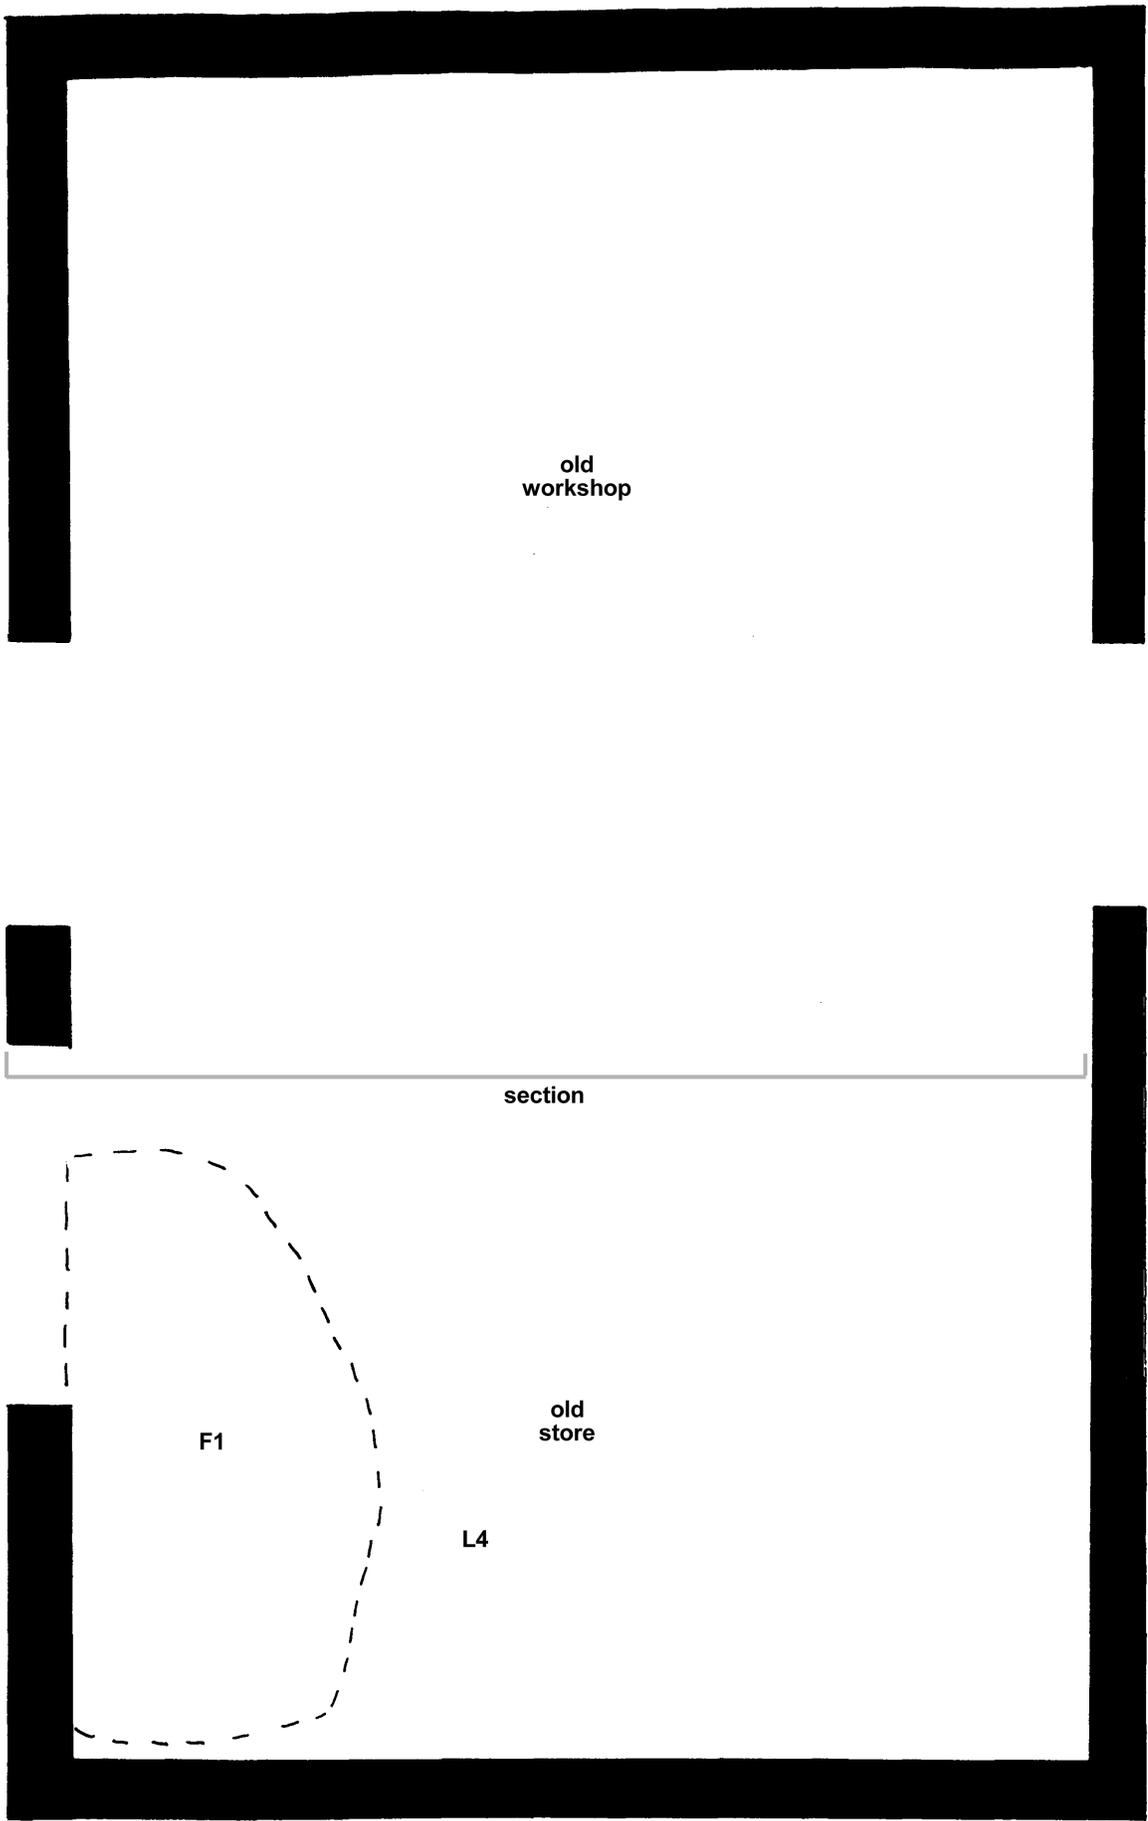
Plan of F1 in old workshop/store, scale 1:20.
